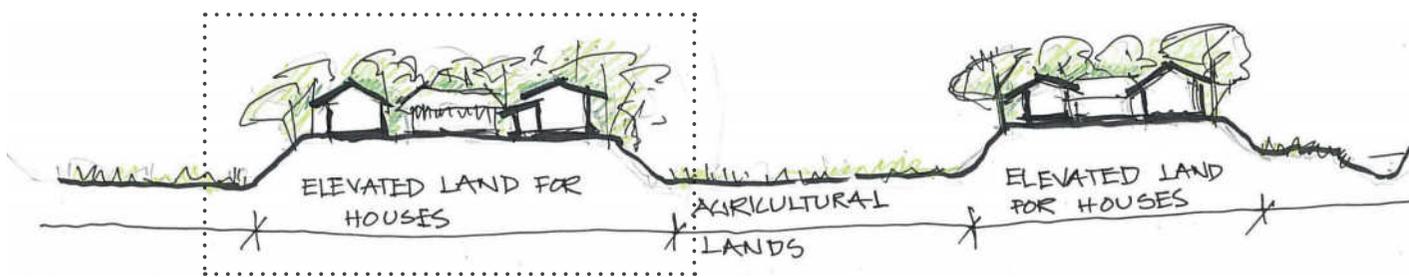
ELEVATED LAND FOR BUILDING HOUSES
